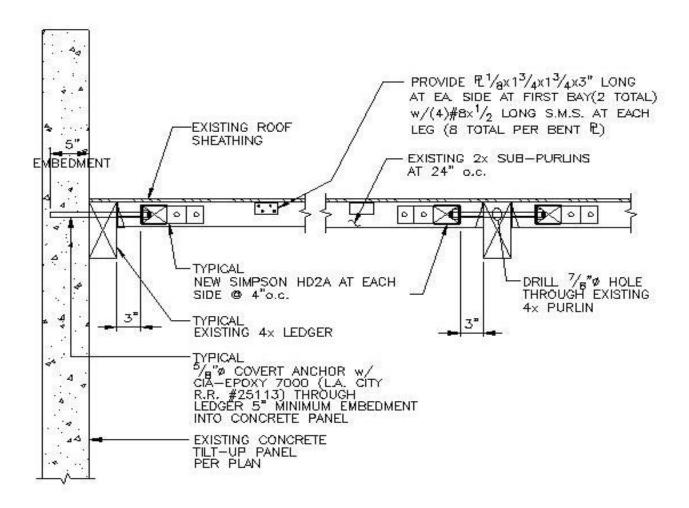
TYPICAL SUB-PURLIN TO EXISTING CONCRETE CONNECTION DETAIL
